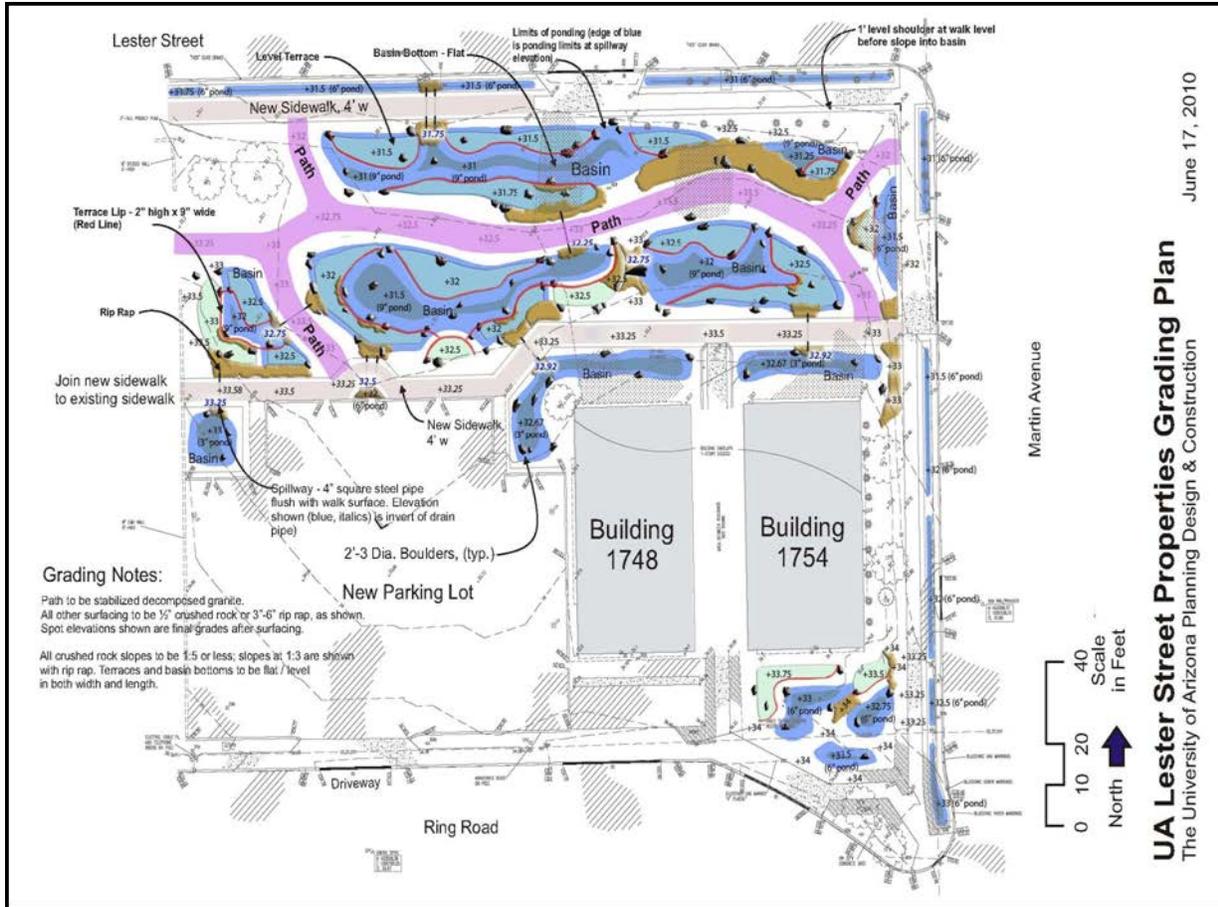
An Example of LID Site Design (University of Arizona, Department of Planning, Design & Construction).
